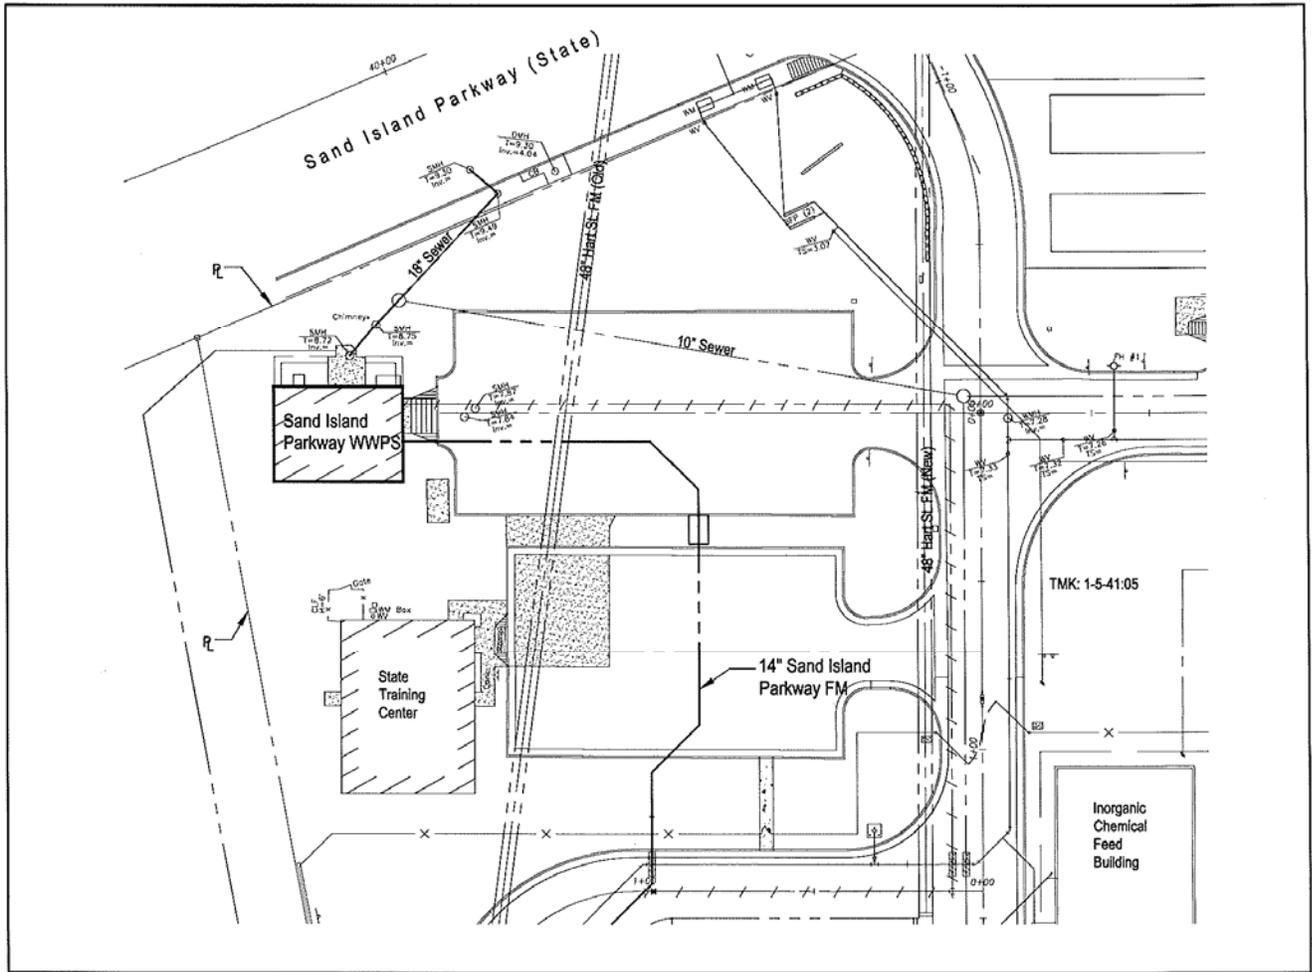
Existing Sand Island Parkway PS Site Plan
